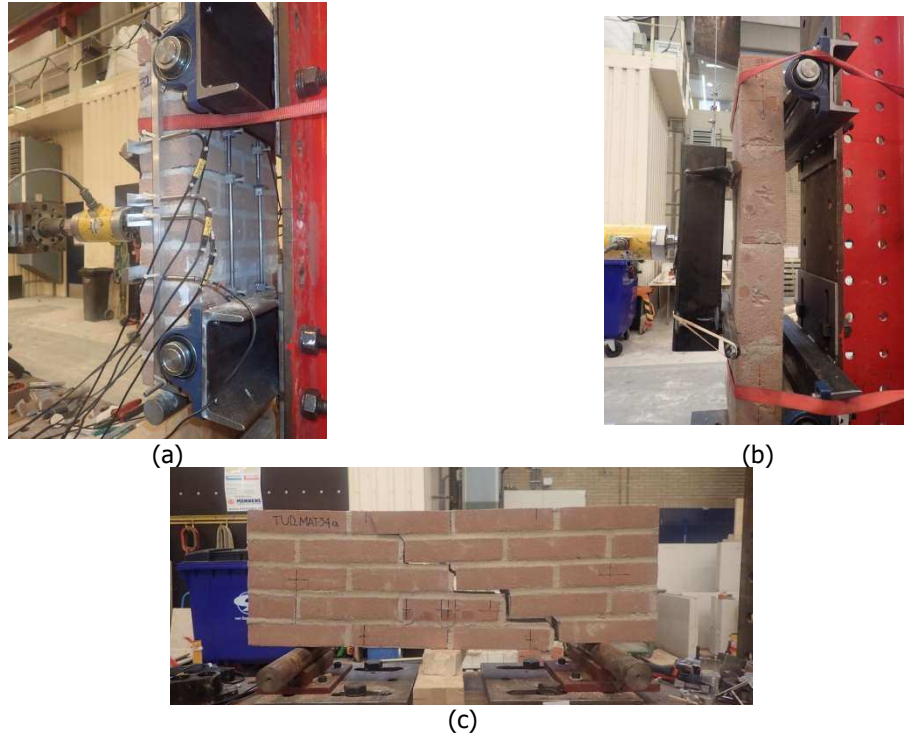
Crack pattern for single wythe specimens subjected to four-point bending: (a) vertical out-of-plane bending; (b) horizontal out-of-plane bending; (c) in-plane bending.
